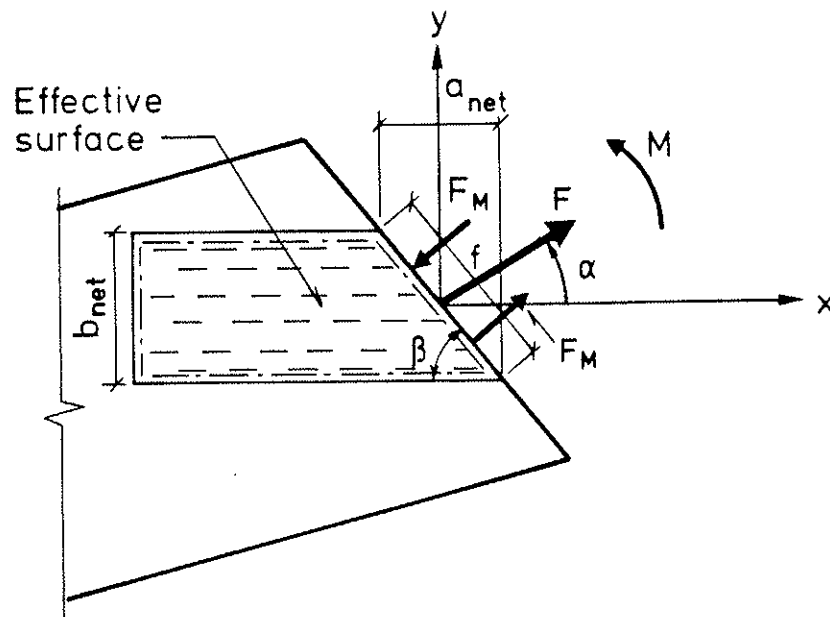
Geometry of the nail plate connection subjected to a force and a moment.
